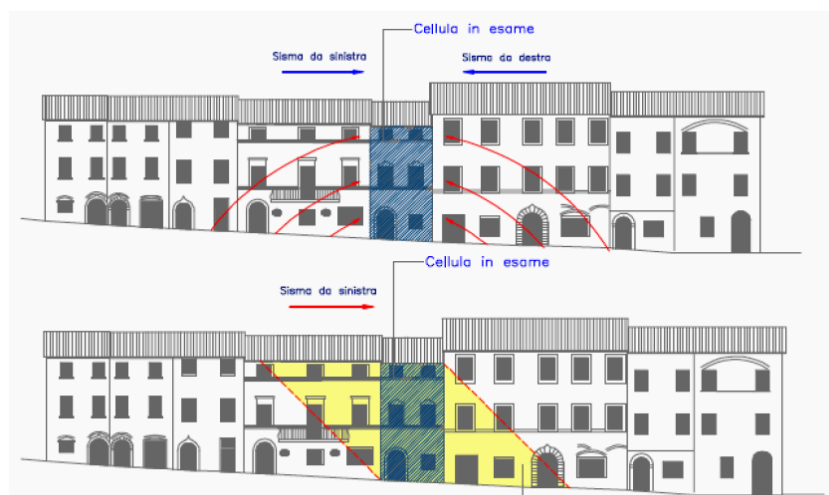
Hammering from adjacent building, (Borri, 2004c)
